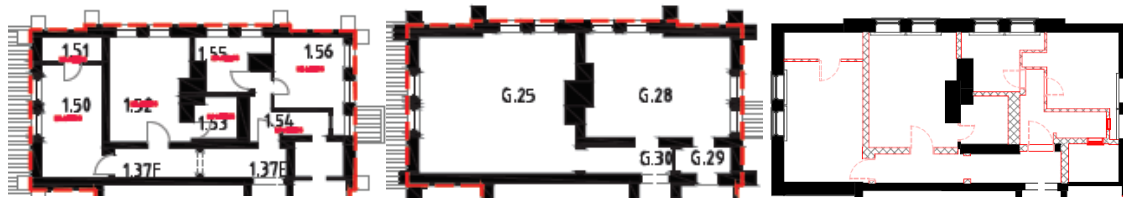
South wing pavilion – first floor, ground floor, and demolition plan
